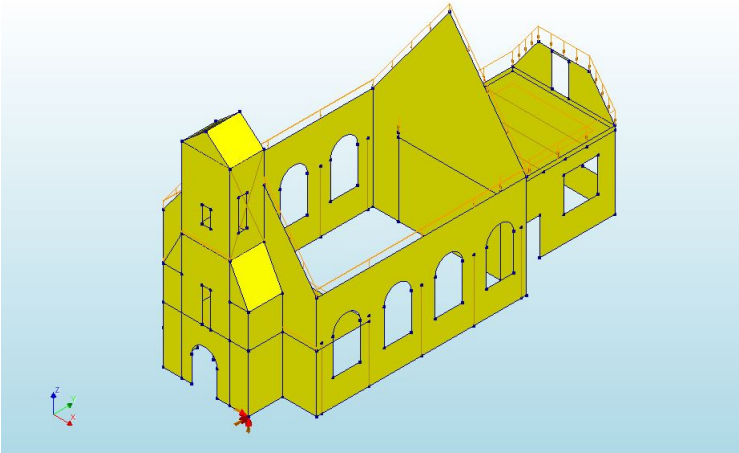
Model 5- without roof structure, applied as a line load on masonry walls
